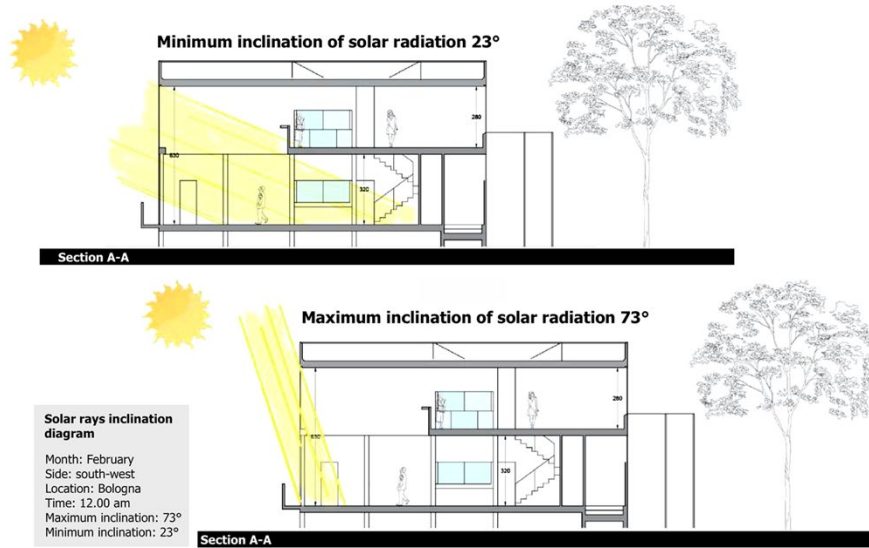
Sections of the building (R. Bellinazzi, 2018)
